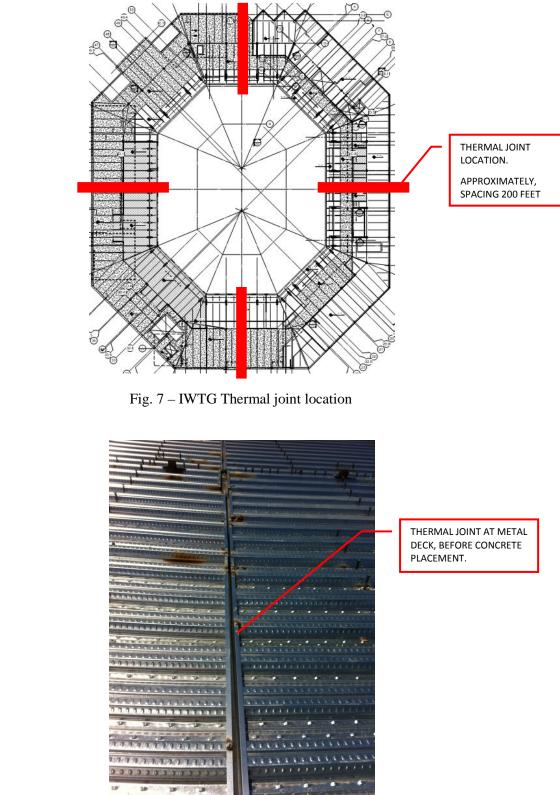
IWTG Thermal joint looking from top of podium deck
